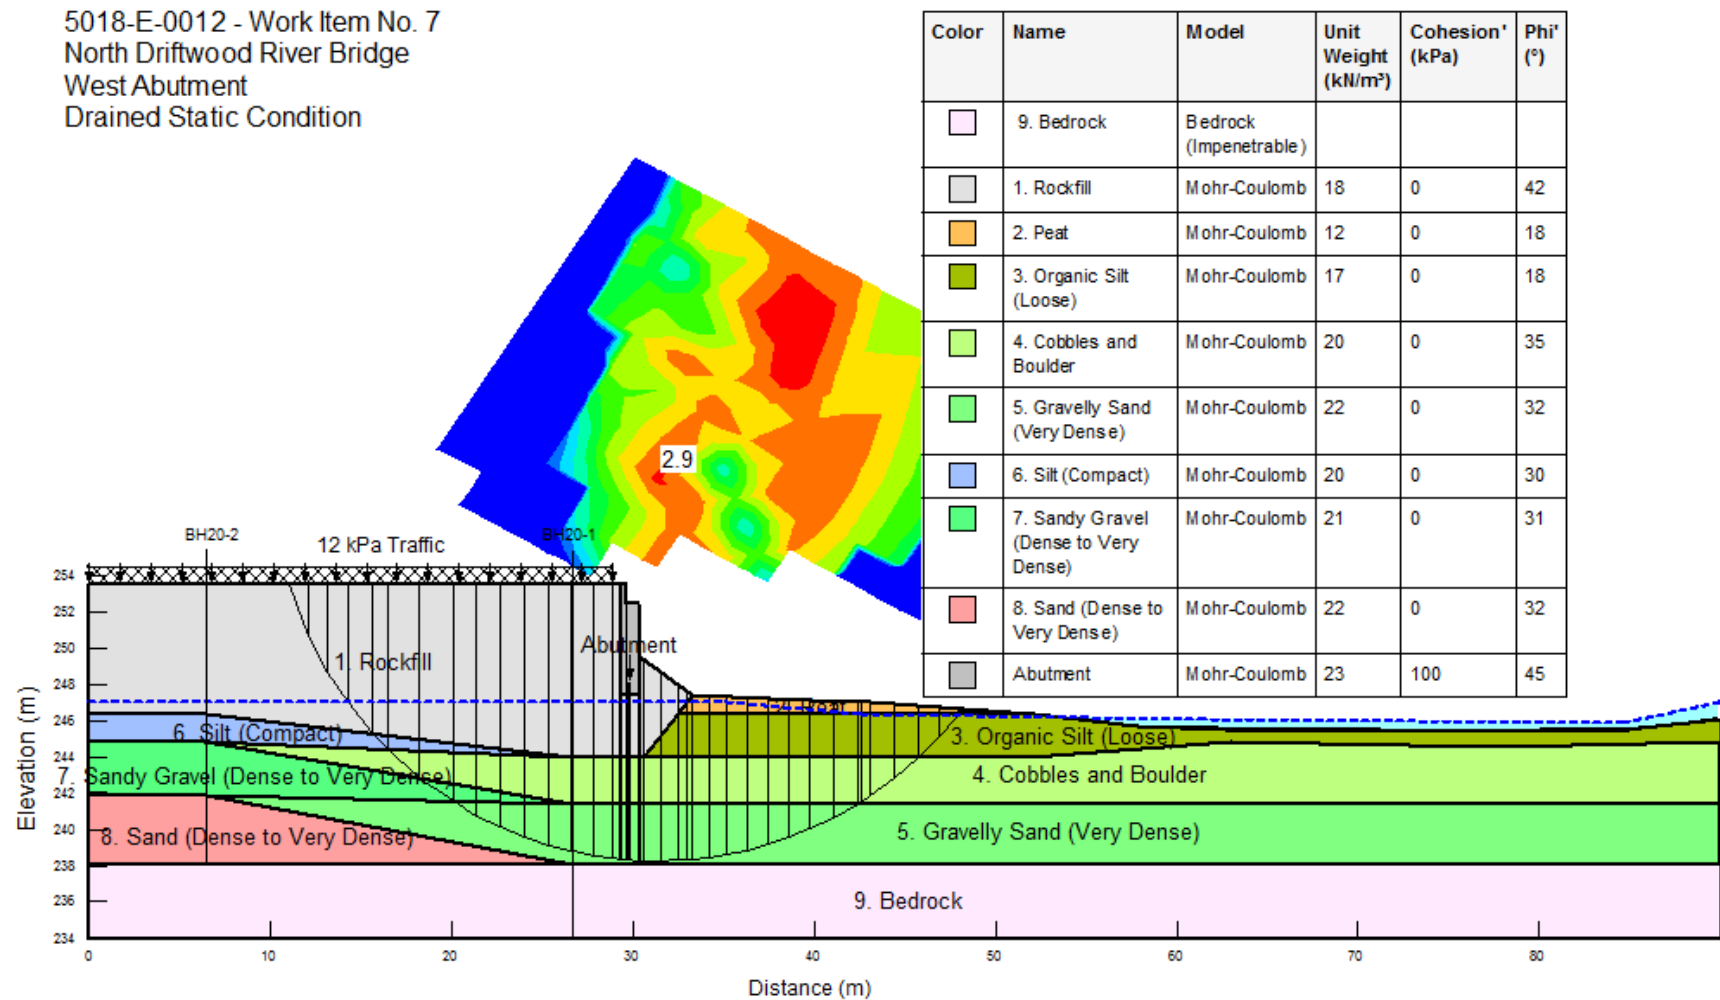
Slope stability analysis for west abutment – drained static condition with H-piles
